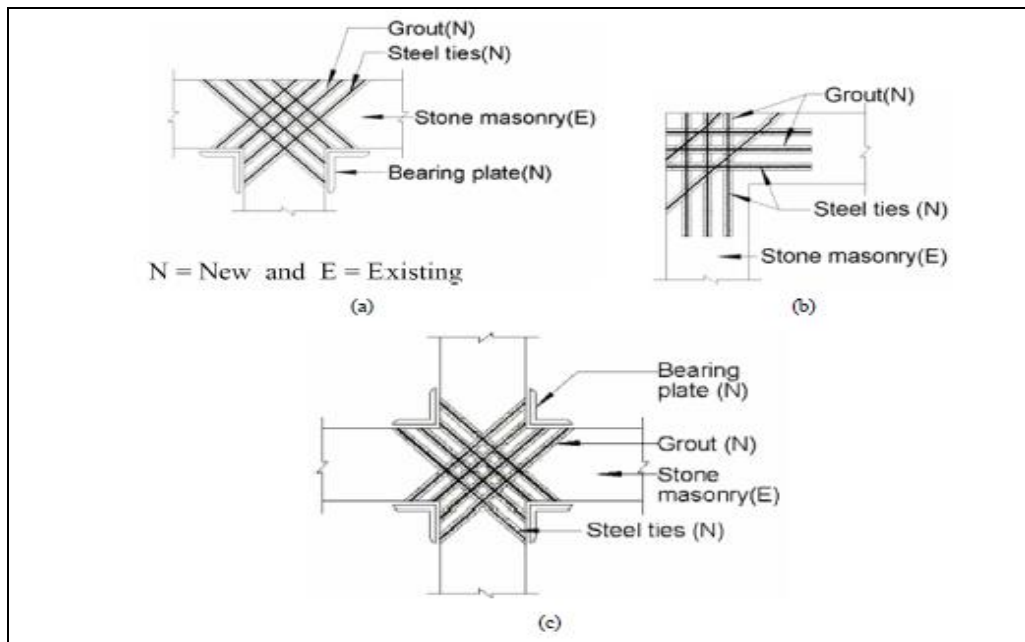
Reinforced injection at intersecting masonry walls, (a) T-intersection (b) L-intersection (c) X-intersection (Korany, 2011)
